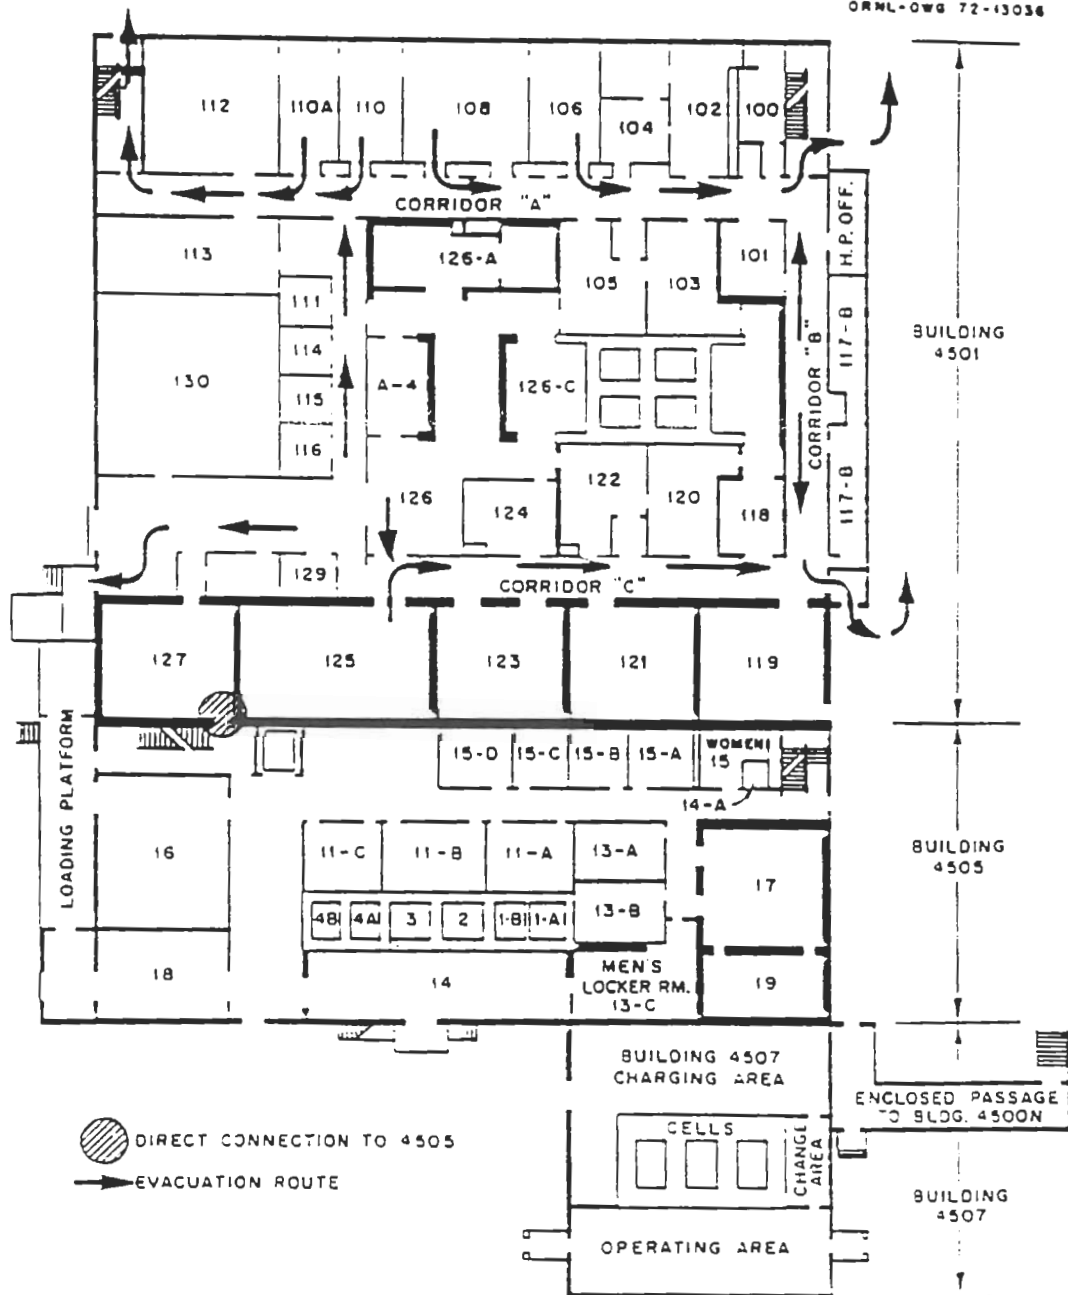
First-floor Plan: Buildings 4501, 4505, and 4507.
